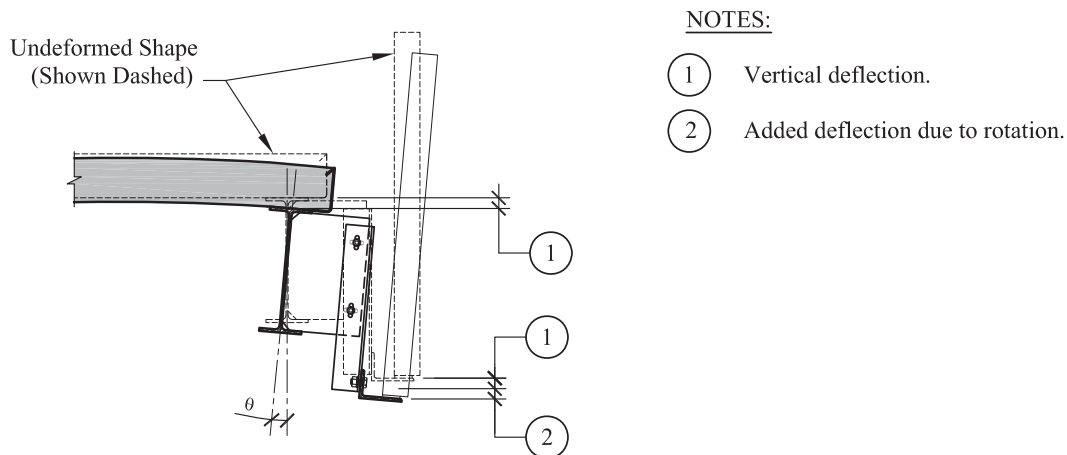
Impact of angular rotation of spandrel beam on façade movement.
